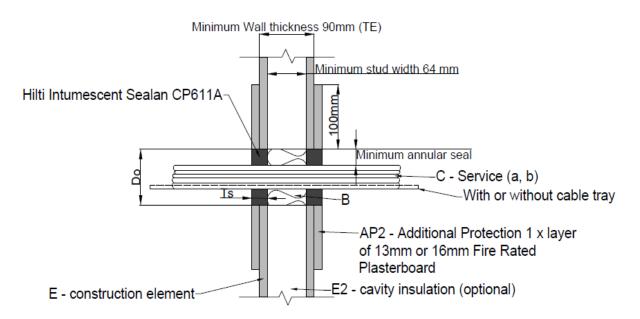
AS 1530.4:2014 D2 Standard Cable Sets, Front View of Seal Type 4. Refer to Table 5
